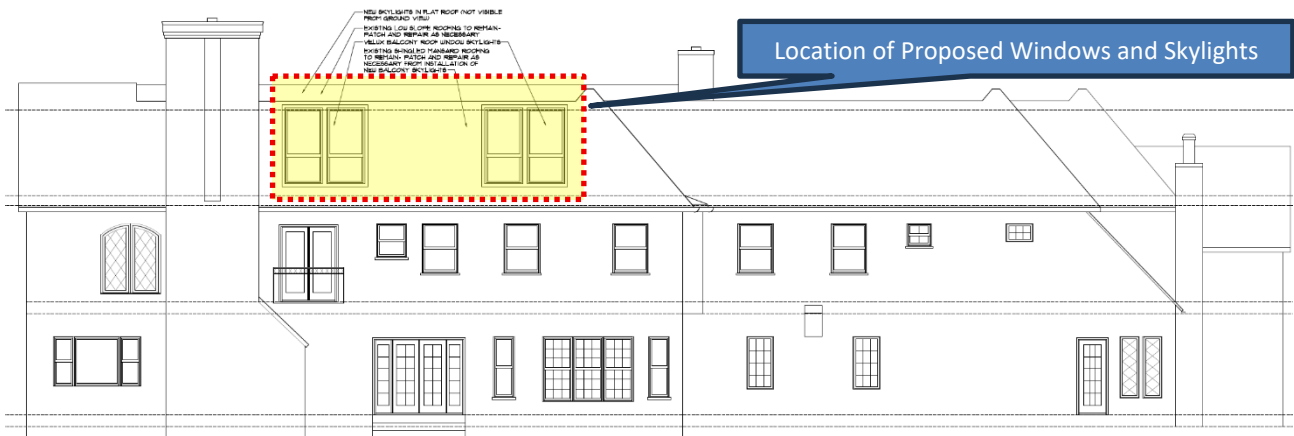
Subject Property – Proposed rear (East) façade elevation rendering of house
